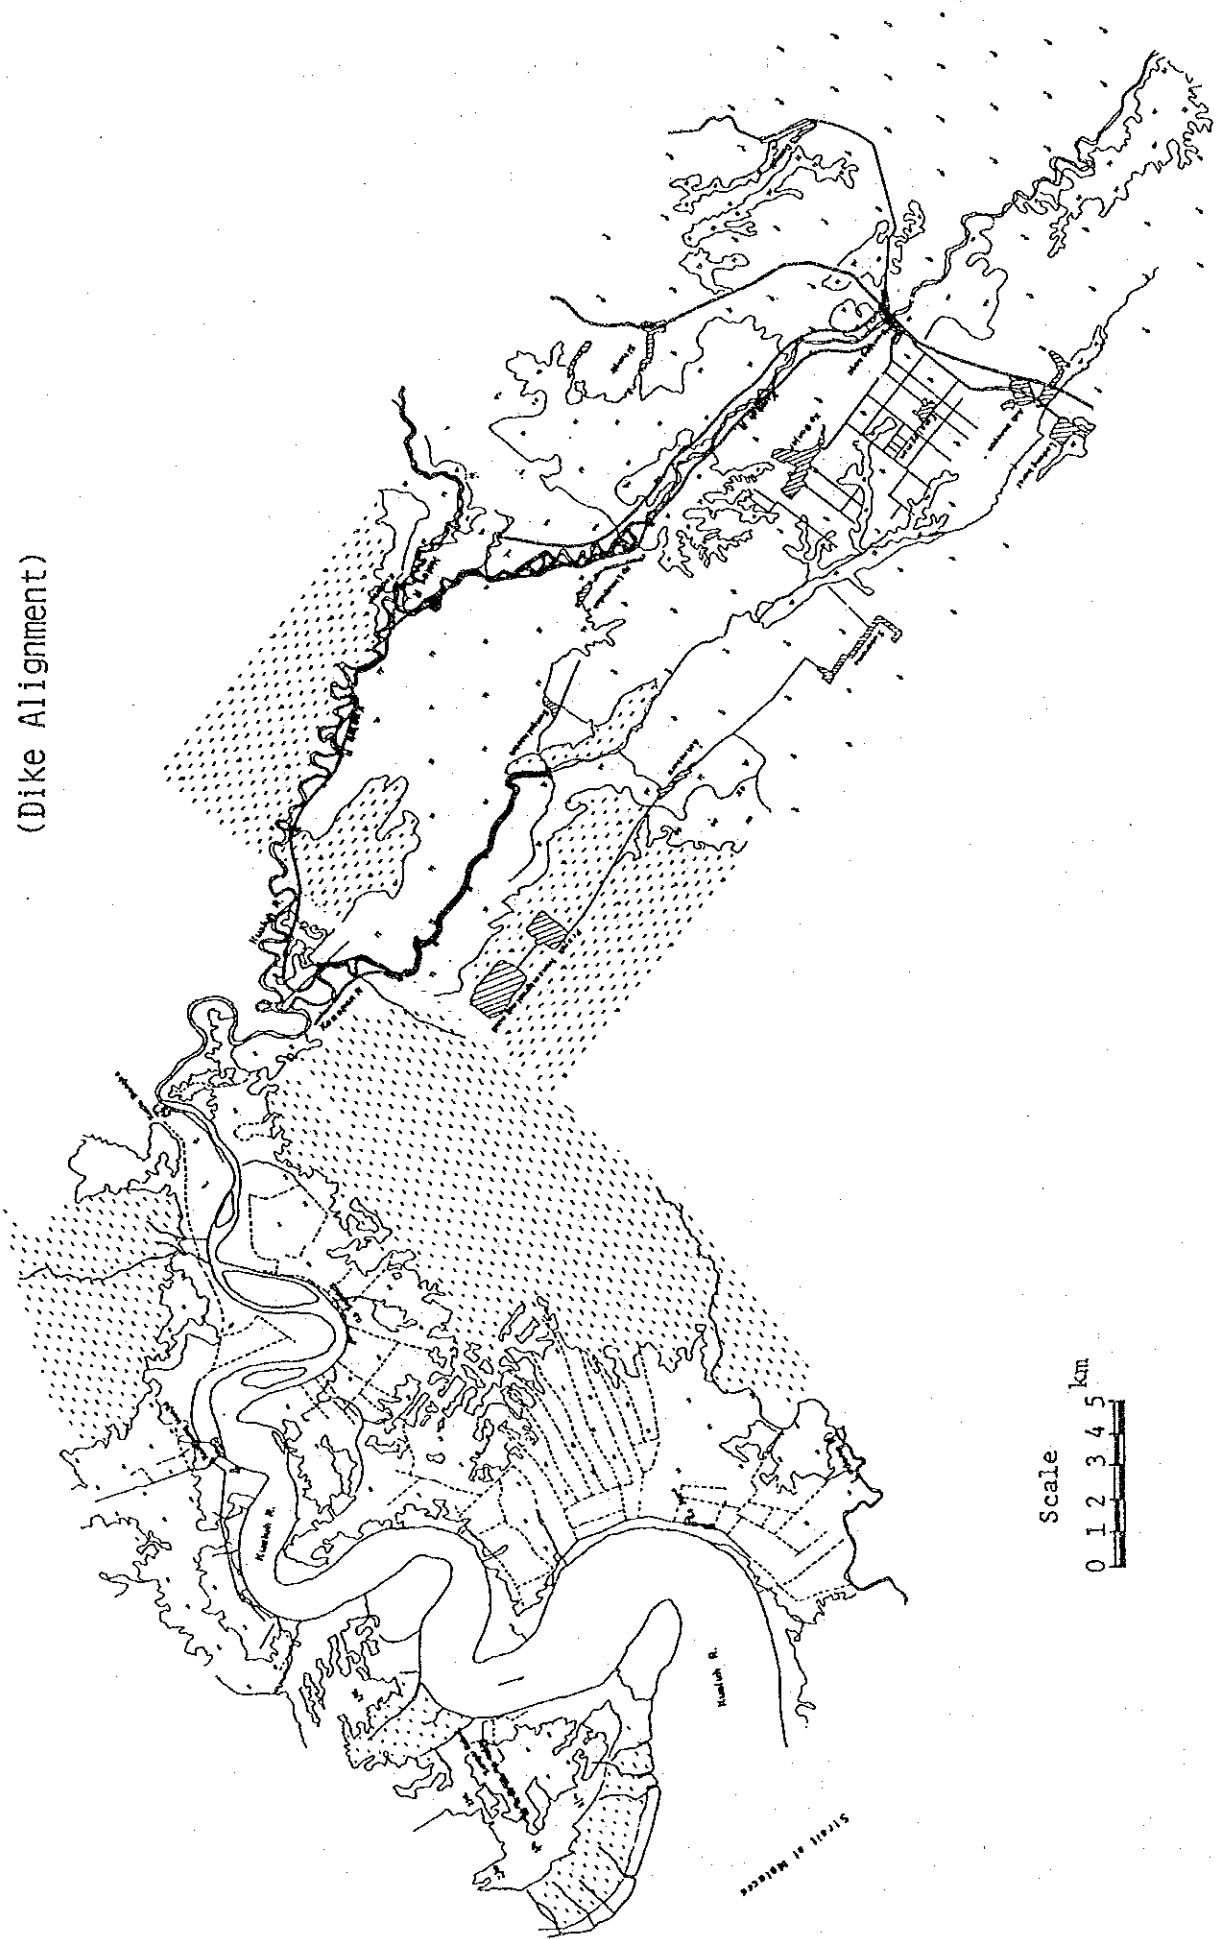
Proposed Long-Term Plan of Kuala Lumpur River (2/3)
